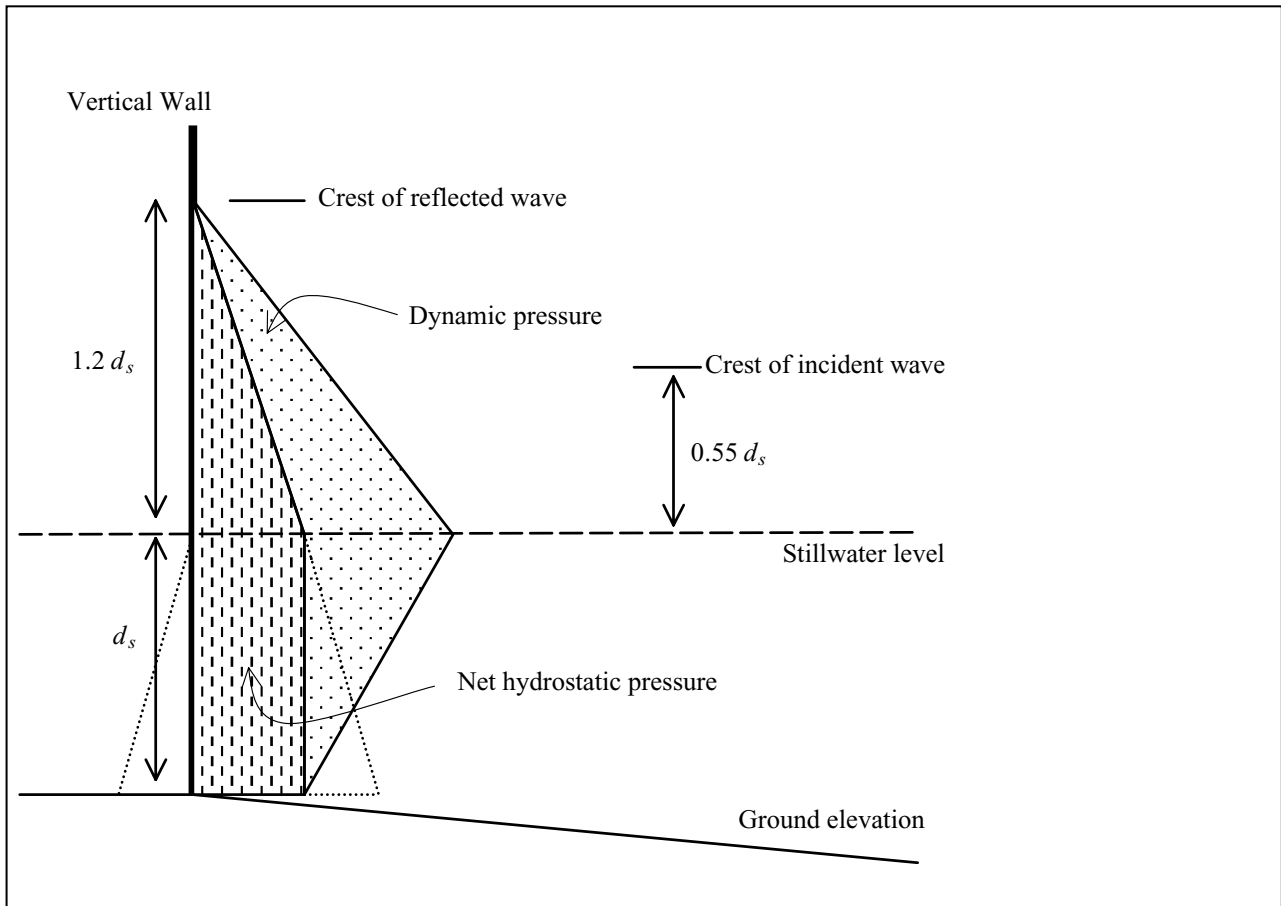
NORMALLY INCIDENT BREAKING WAVE PRESSURES AGAINST A VERTICAL WALL (still water level equal on both sides of wall)
